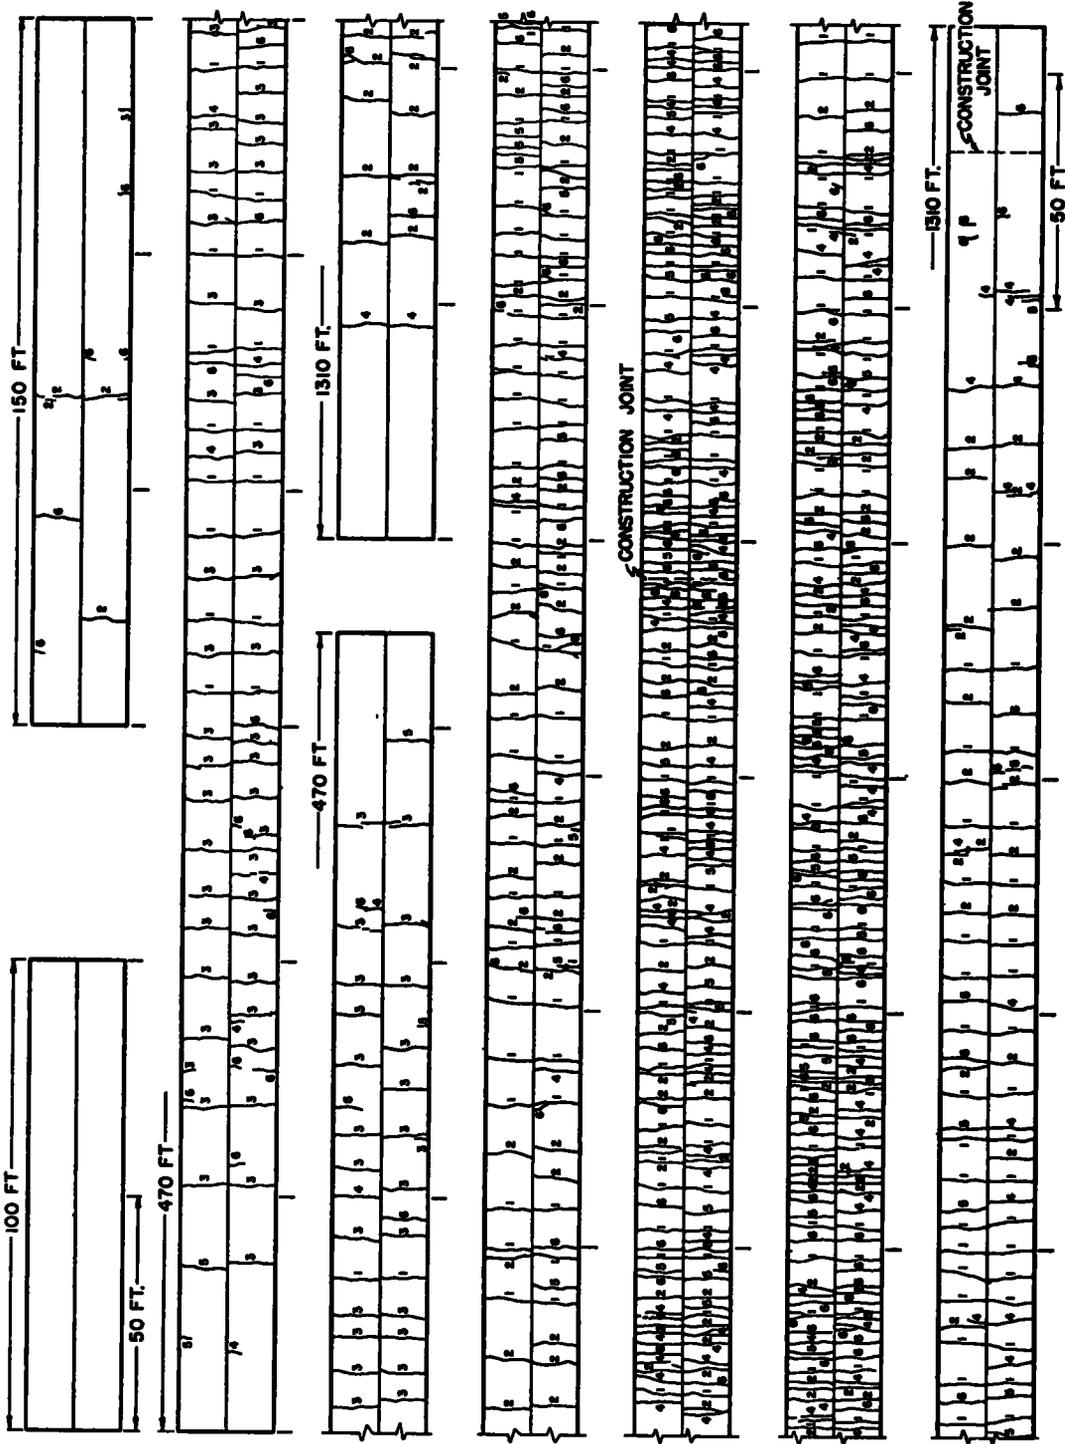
Typical Formation of Cracks During the First 10 Years of Pavement Life — Sections Placed September–October, 1938 Survey: 1—Nov., 1938 2—Nov., 1939 3—Nov., 1940 4—Oct., 1941 5—Oct., 1943 6—Oct., 1948
